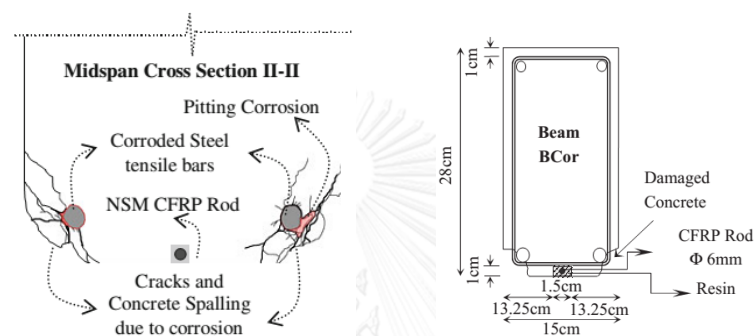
Location of NSM CFRP rod in the tension side of repaired corroded beam [34].
